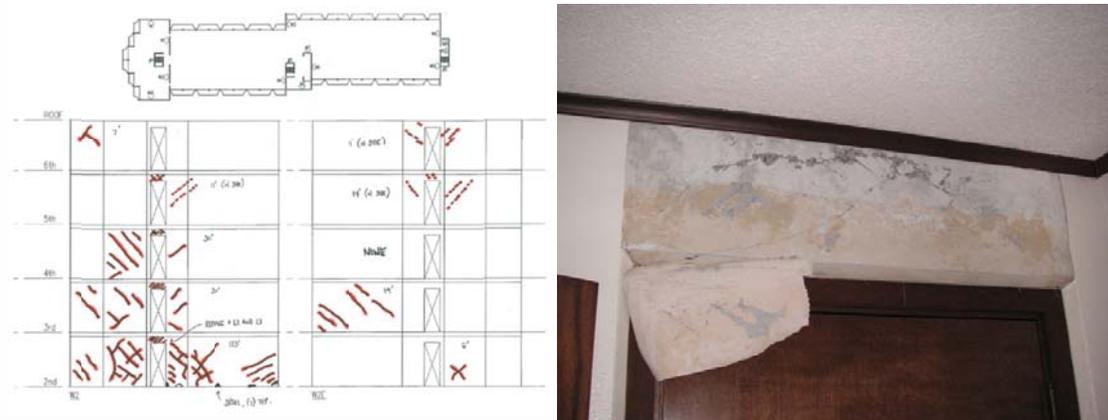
Typical shear wall elevations with crack mapping (left) and damaged link beam (right)
